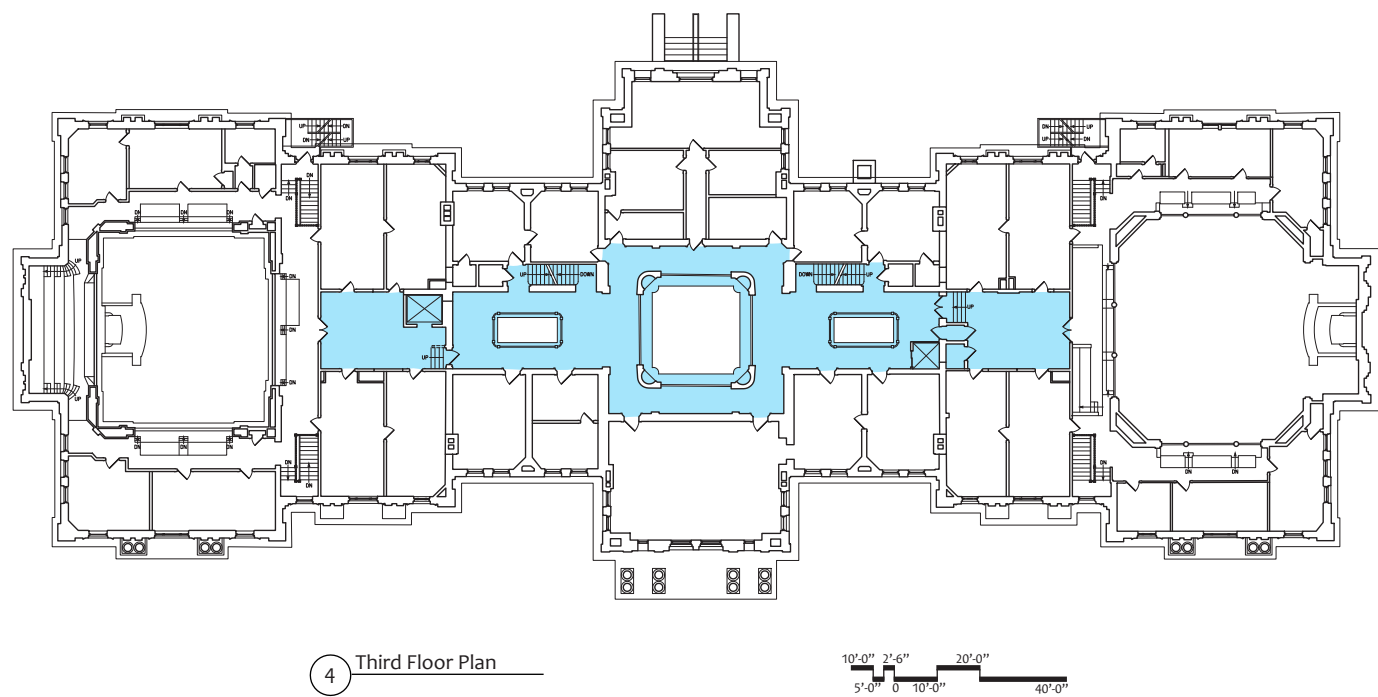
Third Floor Plan of Rotunda and Monumental Corridors [highlighted in light blue]
